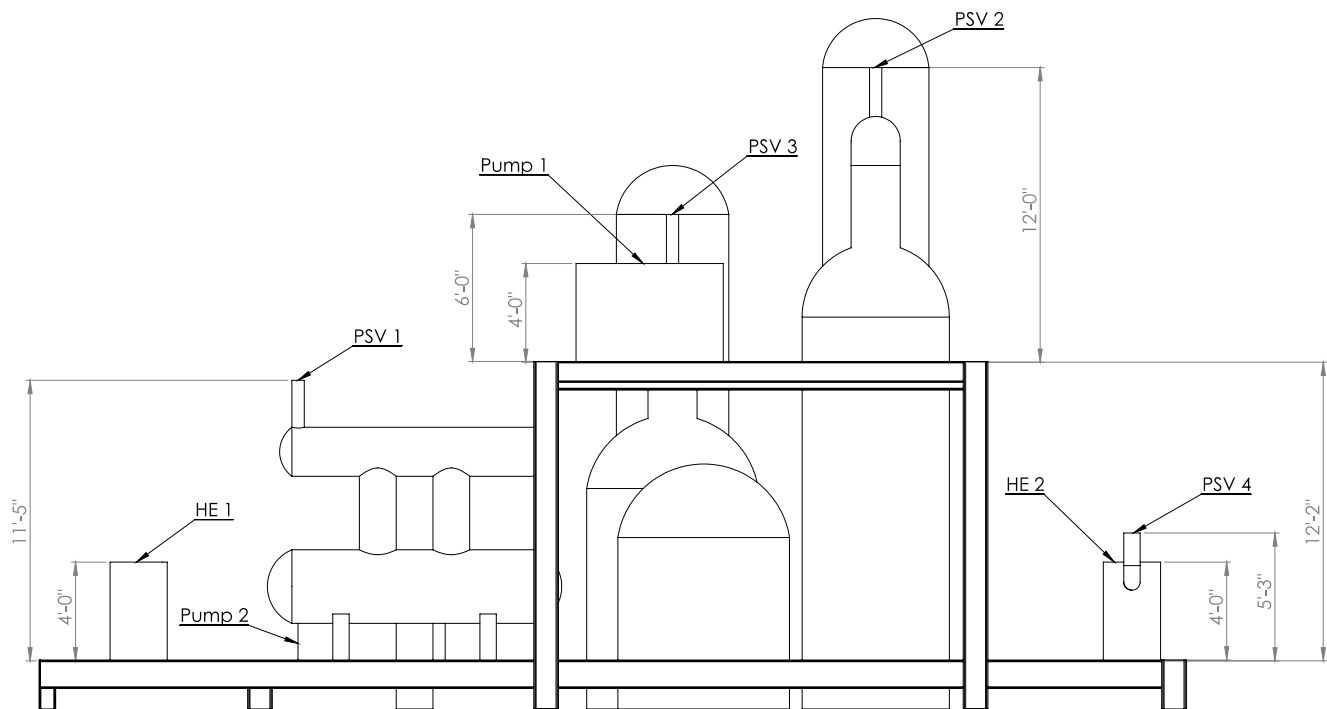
South View Showing Location of Equipment of 6th and 7th Floor
